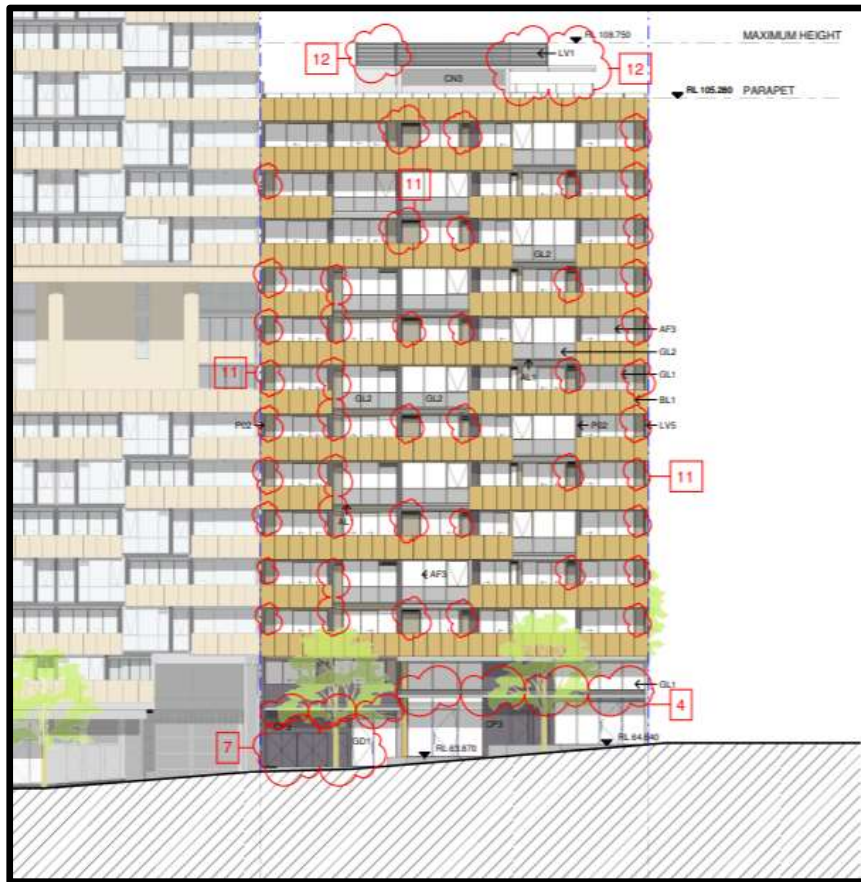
Proposed front elevation as amended (MOD2021/0137)
